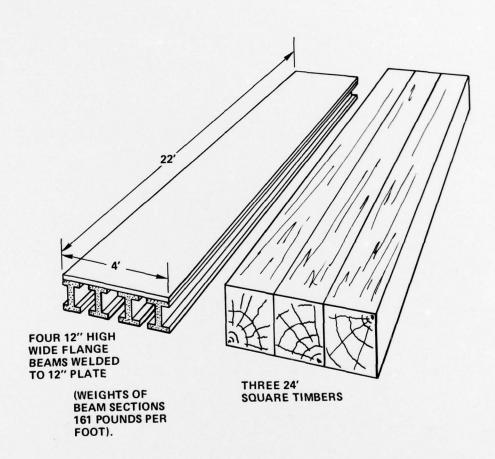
BEAMS SUITABLE FOR SUPPORTING CRANE OUTRIGGER PADS
